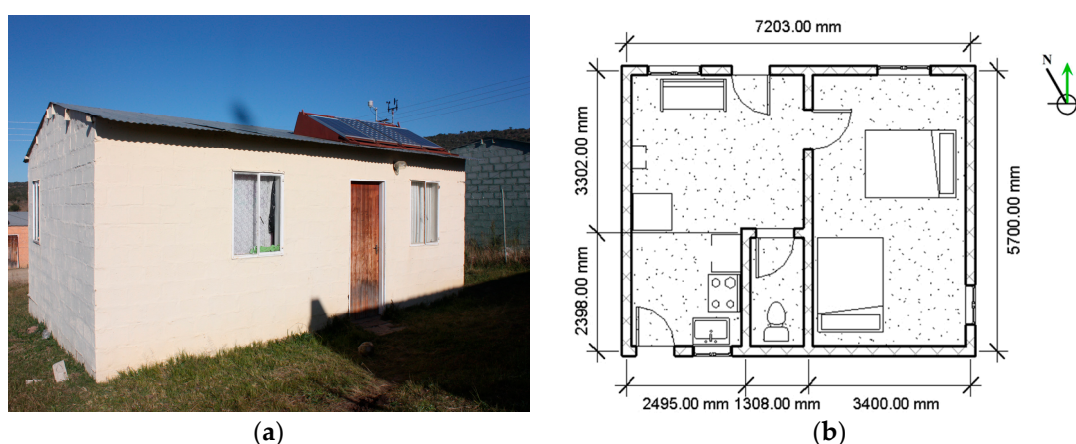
(a) Photo of the low-cost house used as case study (typical South African low-cost housing); and (b) floor plan diagram of the house.
